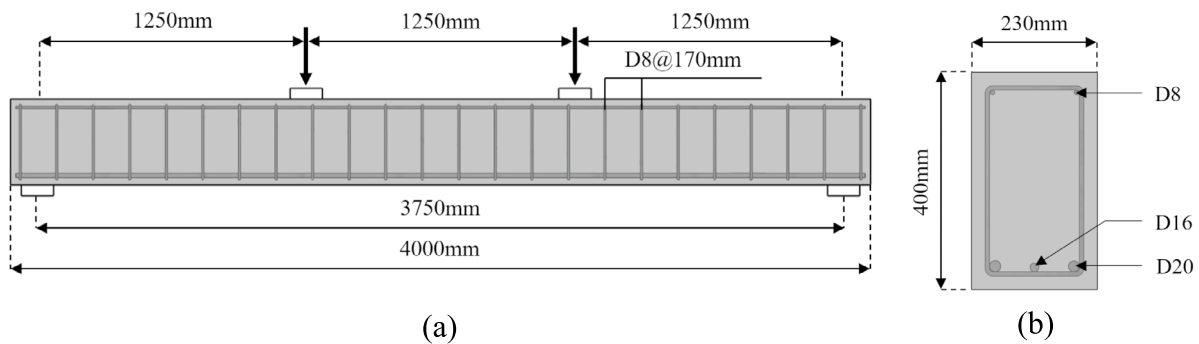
Details of the beam specimens. a Loading arrangement. b Section details
